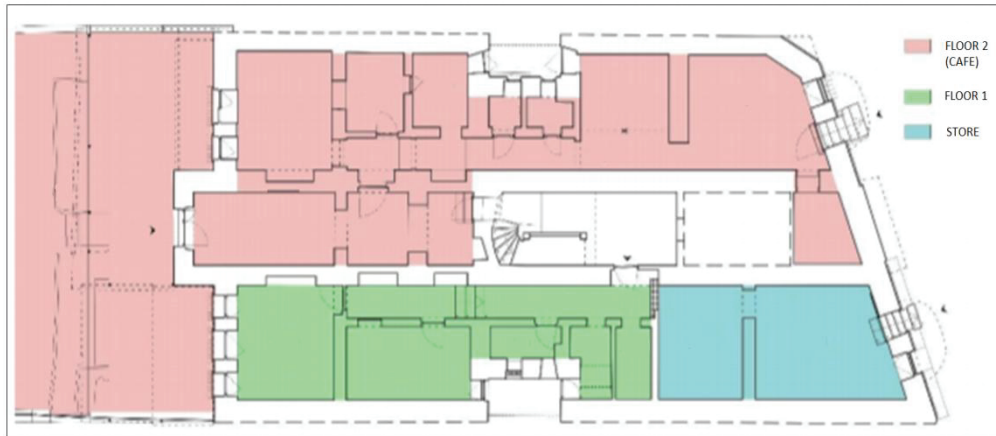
Basement Floor Plan of Tevfik Tura Apartment. (Source : Tunçer 2016)
